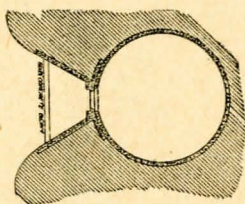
Showing how to build the door supports and retaining walls for a bank silo.
